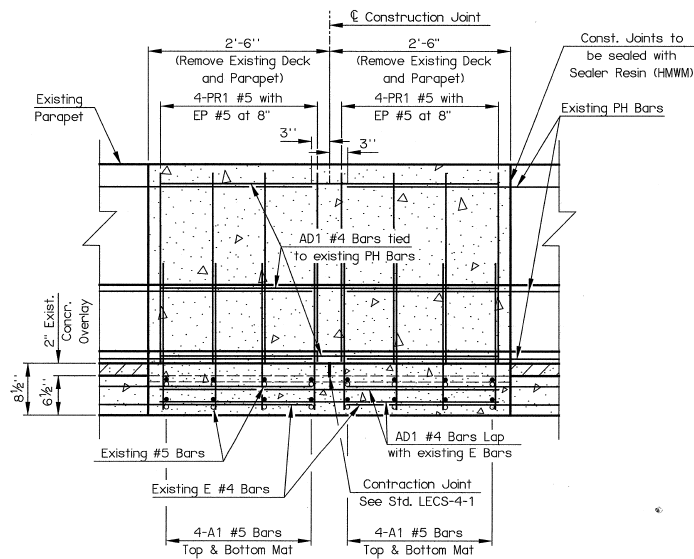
Details of new construction joints at Pier No. 2 and Pier No. 3 for SH-3 north bridge over BNSF railroad
